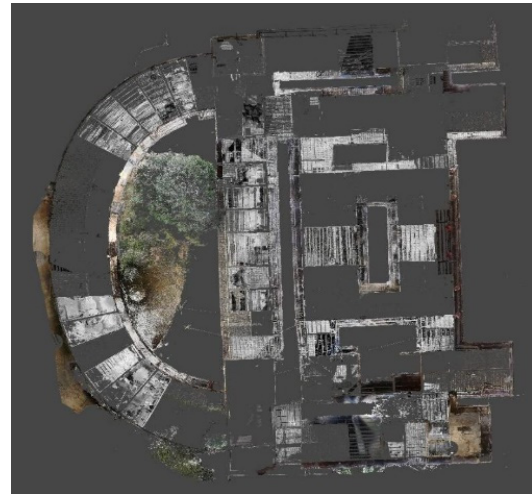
Data Acquisition (Excerpted Drawing - Roof Plan of Swallow Wing Building)
